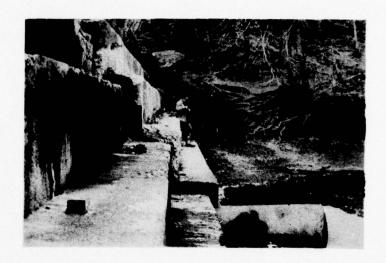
View of the lower left abutment area downstream of the dam $\,$
